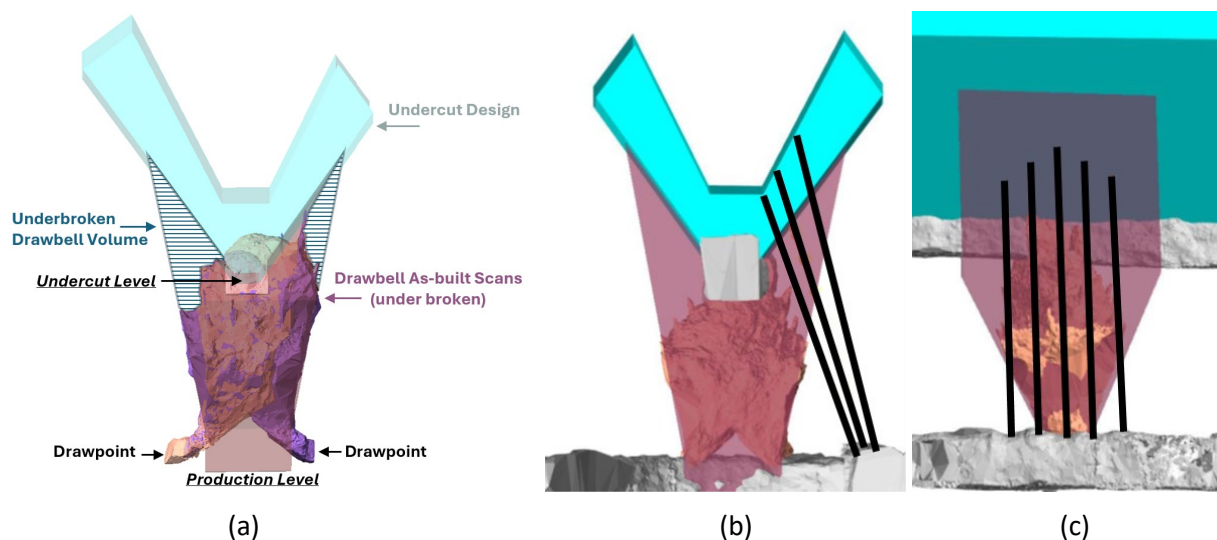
(a) Underbroken drawbell blast, recovery blast drilling holes drilled up from the production drive; (b) Looking perpendicular to the drawbell drive and drawpoints; (c) Looking parallel to the drawbell drive
